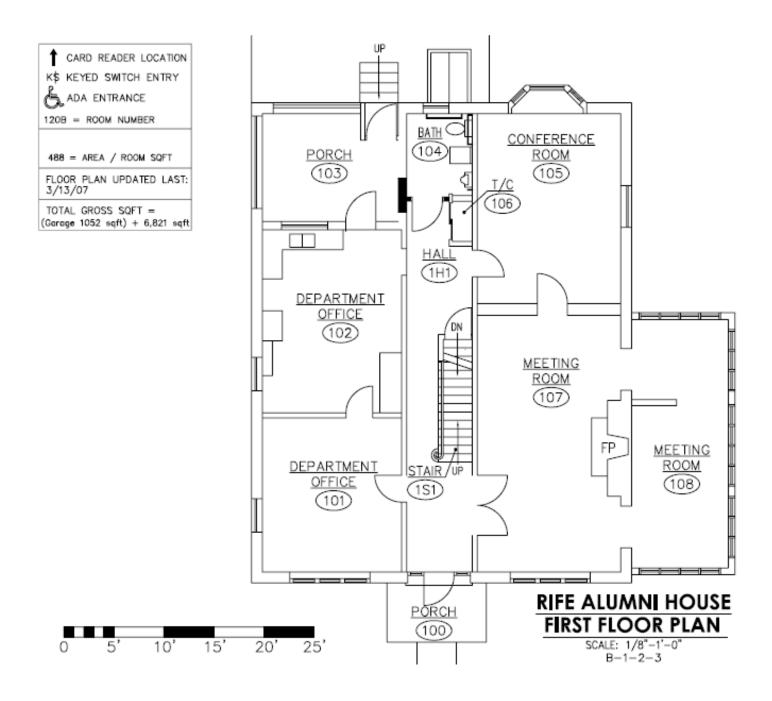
Study Site - Shippensburg University Richard D. Rife Alumni House first floor plan.
